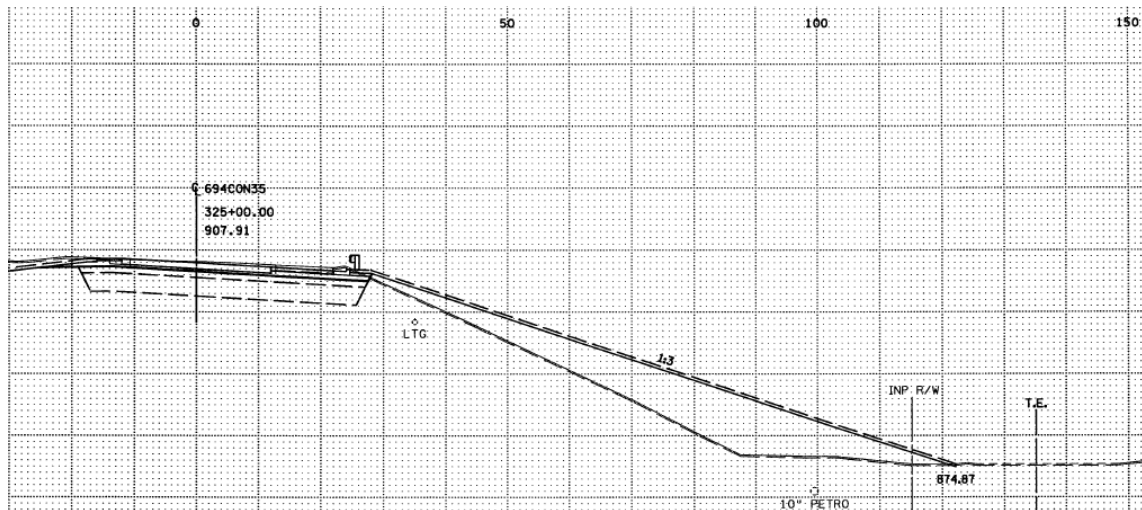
New construction widened the roadway embankment to the west. The toe was extended about 10 feet toward a wetland area flattening the existing slope to a 1H:3V condition. The actual fill placed during the project was only about half of the fill shown in the design drawing (shown).
